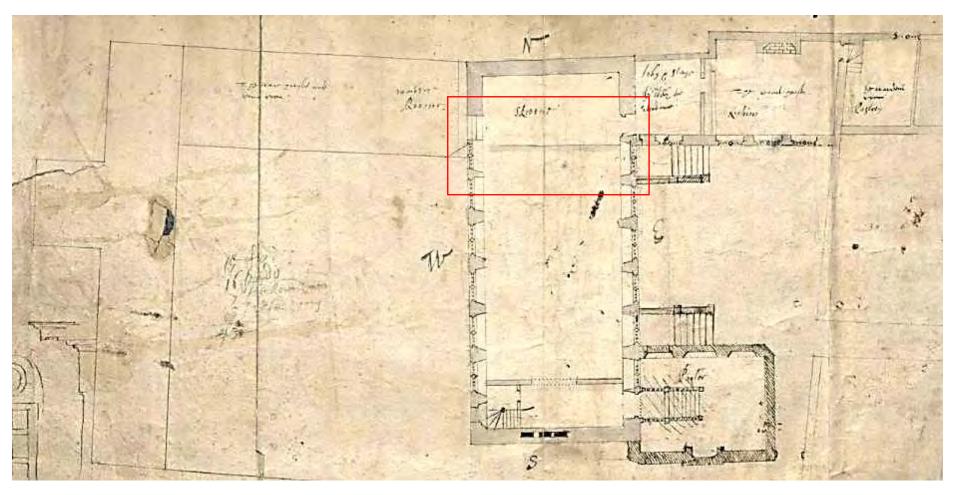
Proposed Hall plan, late-C17 (attributed to 1690/1). Openings from both the Lobby (Anteroom) and the eastern wing are both shown, as is the line of the raised dais to the north of the Hall (Highlighted). Note the cut-back elevation to the much narrower western wing, designed to avoid collision with what appears to be an extra window to the west elevation of the Hall.
